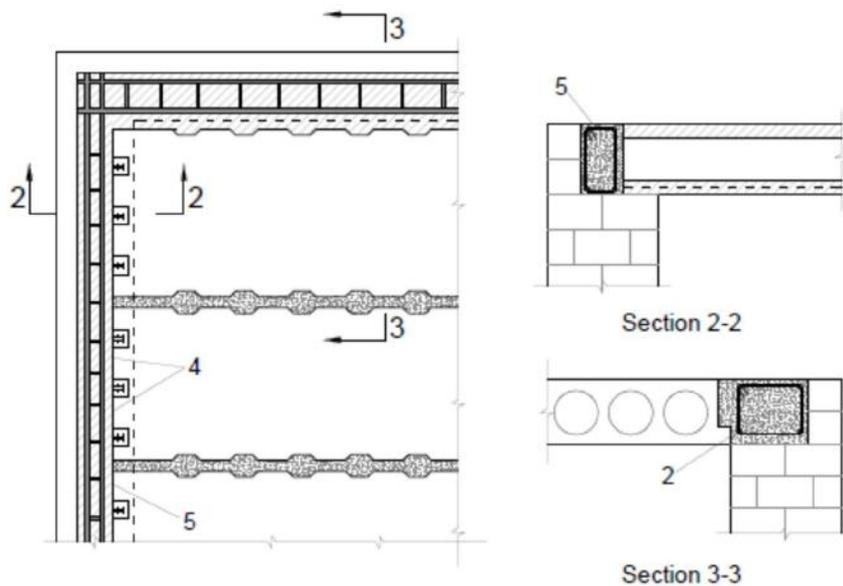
RC horizontal confining elements and floor slab details: 2 – reinforced concrete belt; 3 – 8 mm diameter anchor at 50-60 cm spacing; 4 – frame of binding (stud); 5 – reinforced concrete binding (stud).
